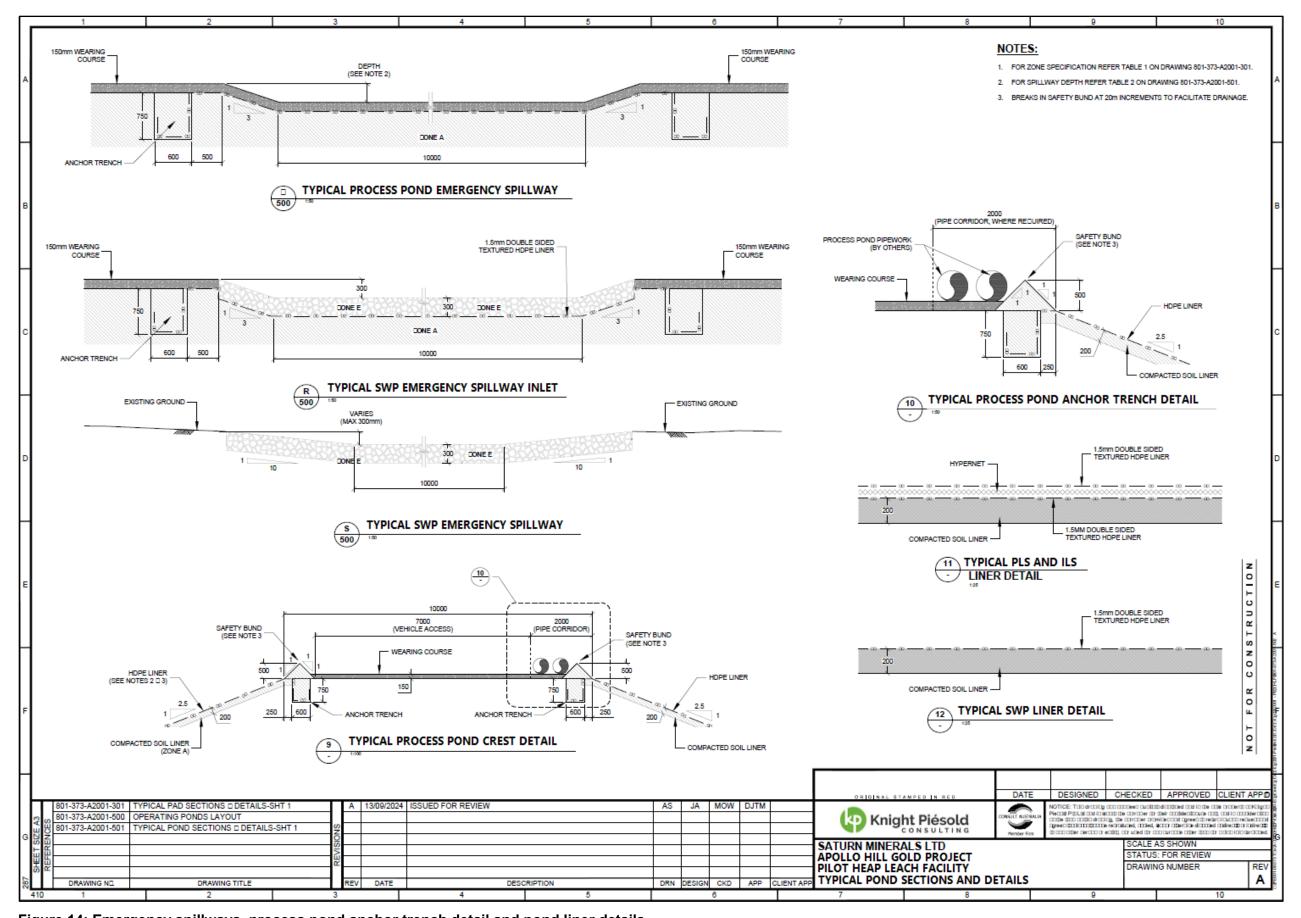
Emergency spillways, process pond anchor trench detail and pond liner details
